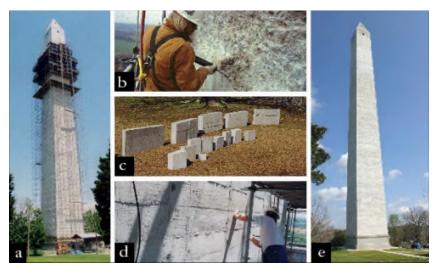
(a) The Jefferson Davis Memorial in Fairview, Kentucky, constructed from 1917-1924, is 351 feet tall and constructed of unreinforced concrete. The walls of the memorial are 8 feet thick at the base and 2 feet thick at the top of the wall. Access to the monument for investigation was provided by rappelling techniques, while ground supported and suspended scaffolding was used to access the exterior during repairs. (b) The concrete was severely deteriorated at isolated locations, with spalling and damage from cyclic freezing and thawing of entrapped water. In addition, previous repairs were at the end of their service life and removal of deteriorated concrete and failed previous repairs was required. Light duty chipping hammers were used to avoid damage to adjacent material when removing deteriorated concrete to the level of sound concrete. (c) Field samples were performed to match the color, finish, and texture of the original concrete. A challenge in matching of historic concrete is achieving variability of appearance. (d) The completed surface after repairs exhibits intentional variability of the concrete surface to match the appearance of the original concrete. Some formwork imperfections that would normally be removed by finishing were intentionally left in place, to replicate the highly variable finish of the original concrete. (e) The Jefferson Davis Memorial after completion of repairs in 2004. Photo e: Joseph Lenzi, Senier, Campbell & Associates, Inc.
